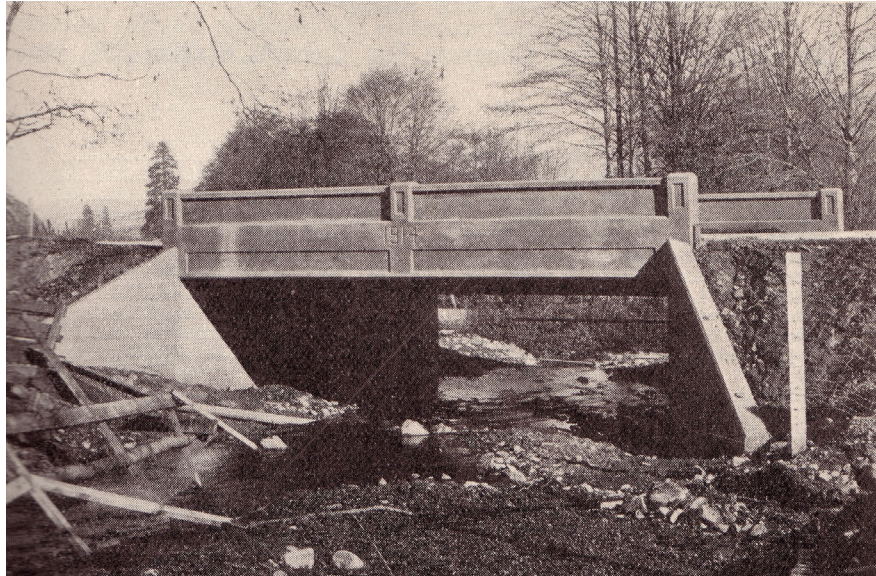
“Type of Concrete Bridge Erected Along Pacific Highway in Jackson County”
